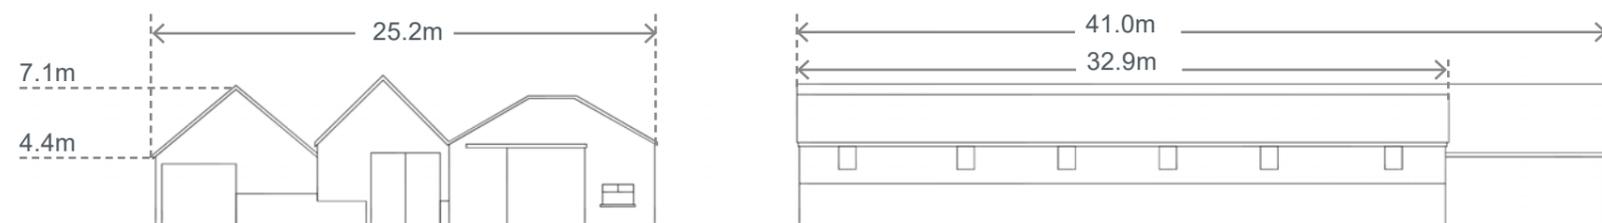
Elevational study of barns at Little Bromley Hall Farm
